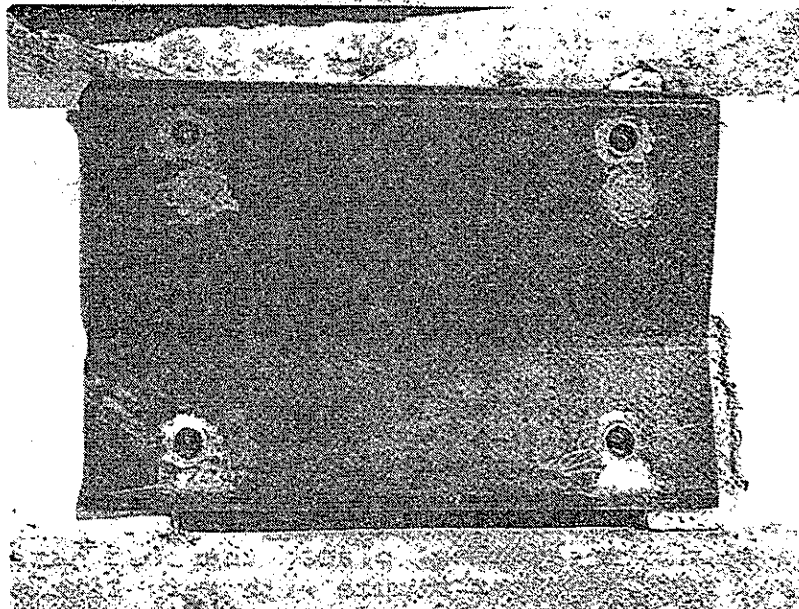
, STEEL COVER PLATES PROVIDE GEOMETRIC CONTINUITY THROUGH GAP BETWEEN BARRIER SECTIONS.
